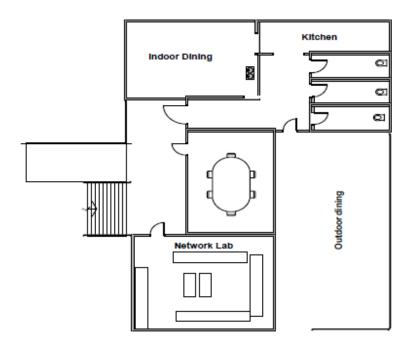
CRTC Outbuilding (Source: IBLF/CRTAD PMU PROJECT HANDOVER, 2010)
